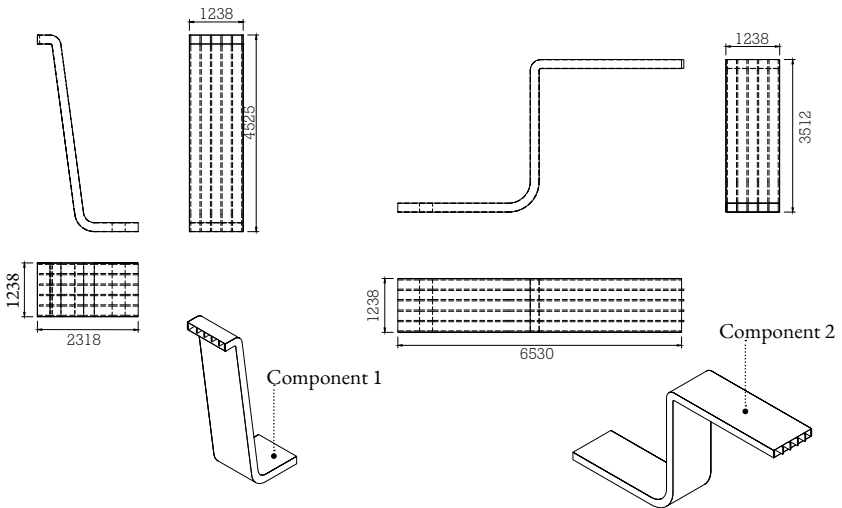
Constructive detail - Structural display components | Axonometric views and dimensioned projections.
